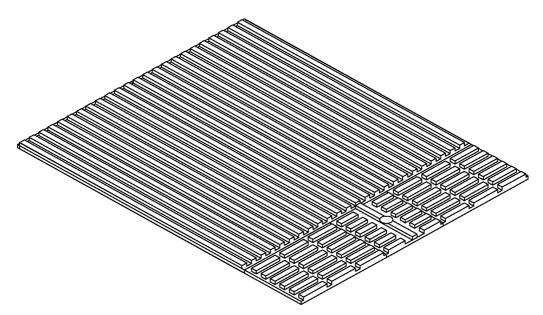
Ventilated insulation system showing the ventilated panels, the distribution panels and the air inlet/outlet
